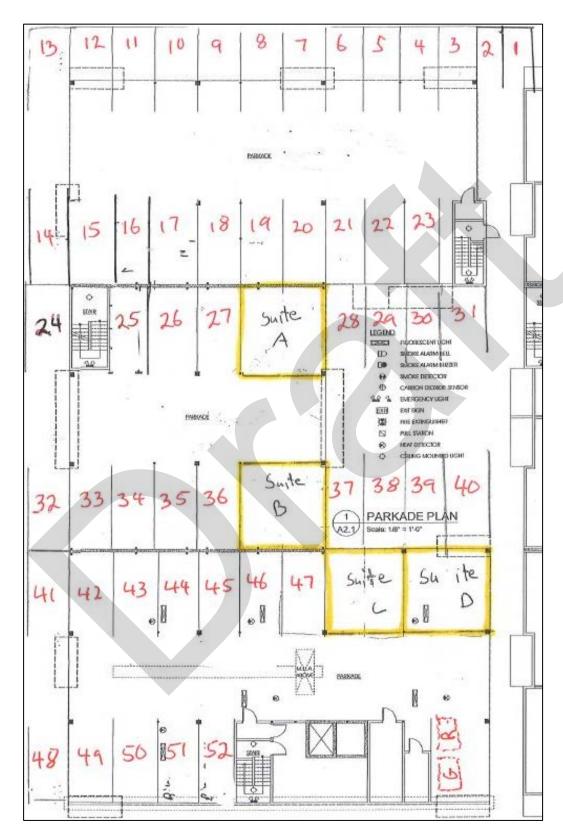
Proposed Site Plan showing conversion of parking spaces to suites
